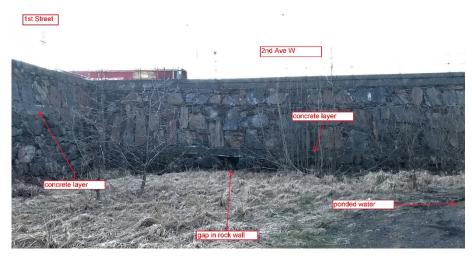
View of rock wall at the corner of 1st Street and 2nd Ave with vegetation and gap visible in the base of the wall. Taken from the south end of the parking lot looking west.
